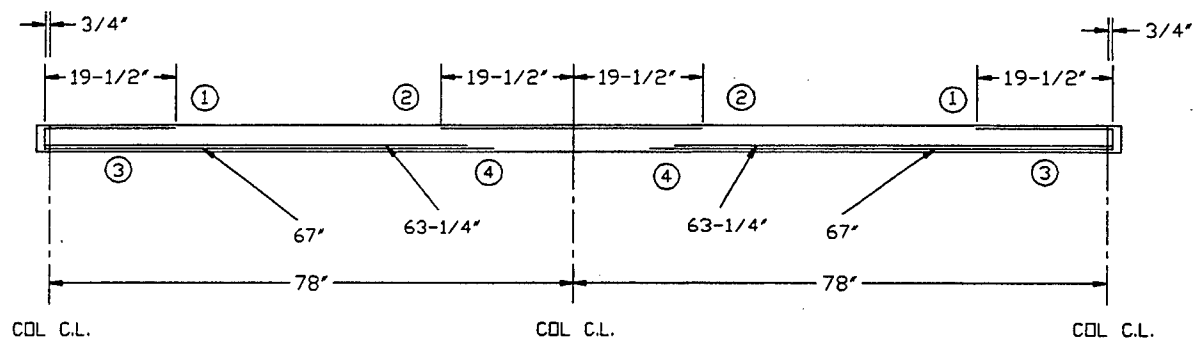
Longitudinal Reinforcement in Model Slabs, Top Bars
